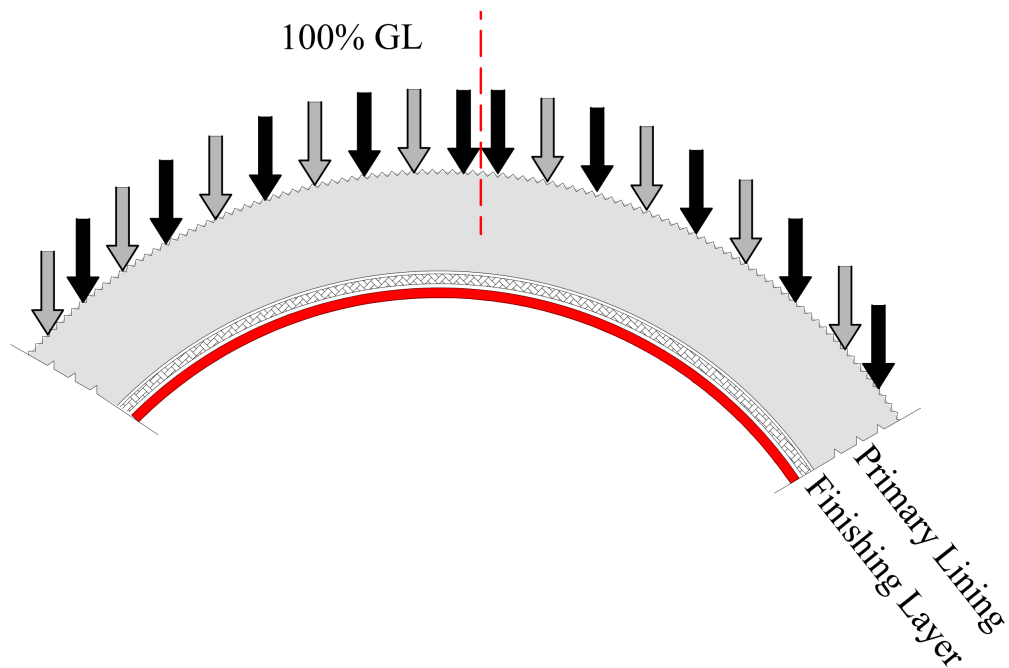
Typical cross-section and loading configuration of a single shell lining.
